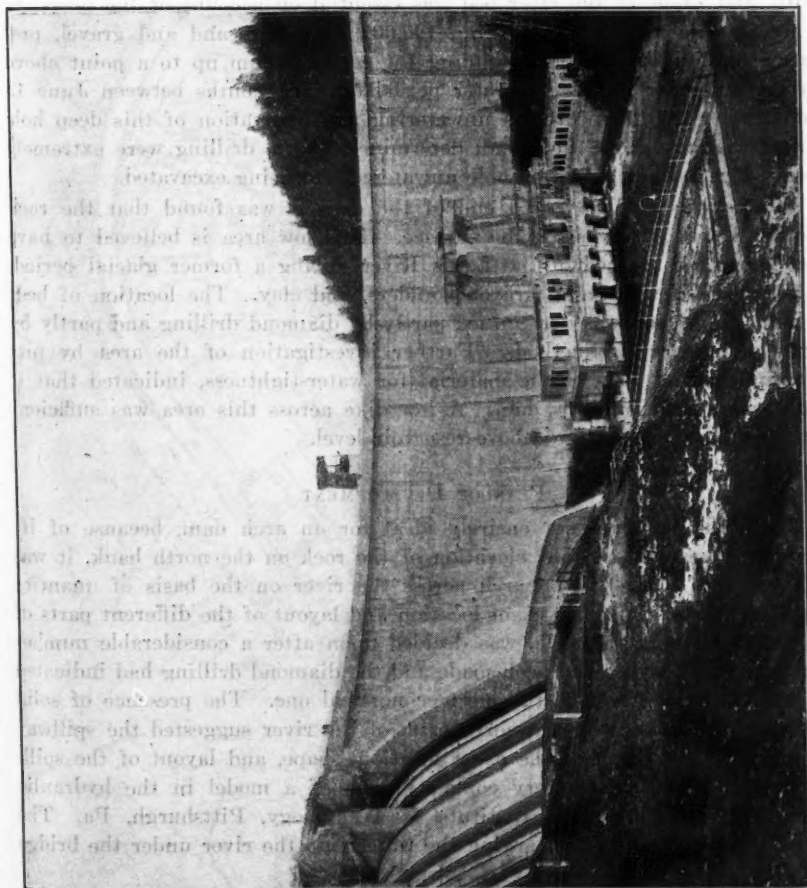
GENERAL VIEW OF DAM AND POWER HOUSE.
